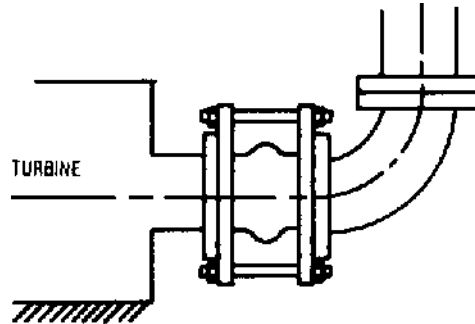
Expansion Joint with Tie Rods (Acceptable)
